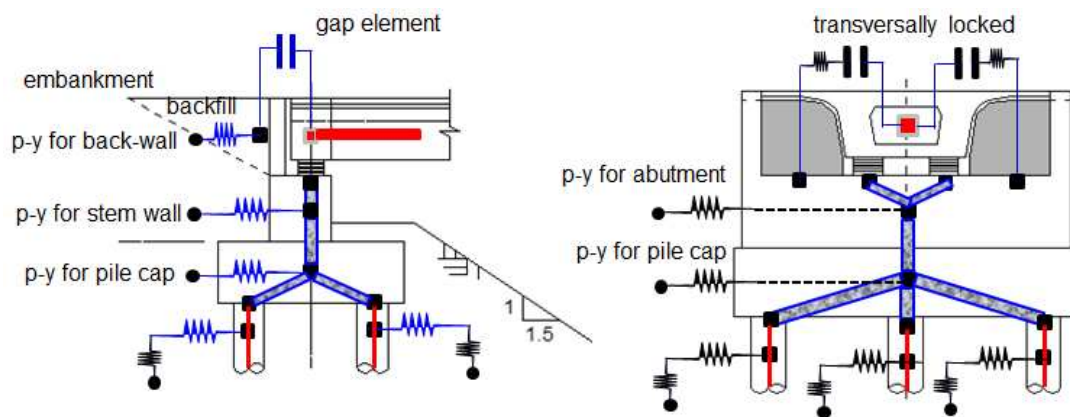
Schematic view of abutment model in both longitudinal direction (left) and transverse direction (right)
